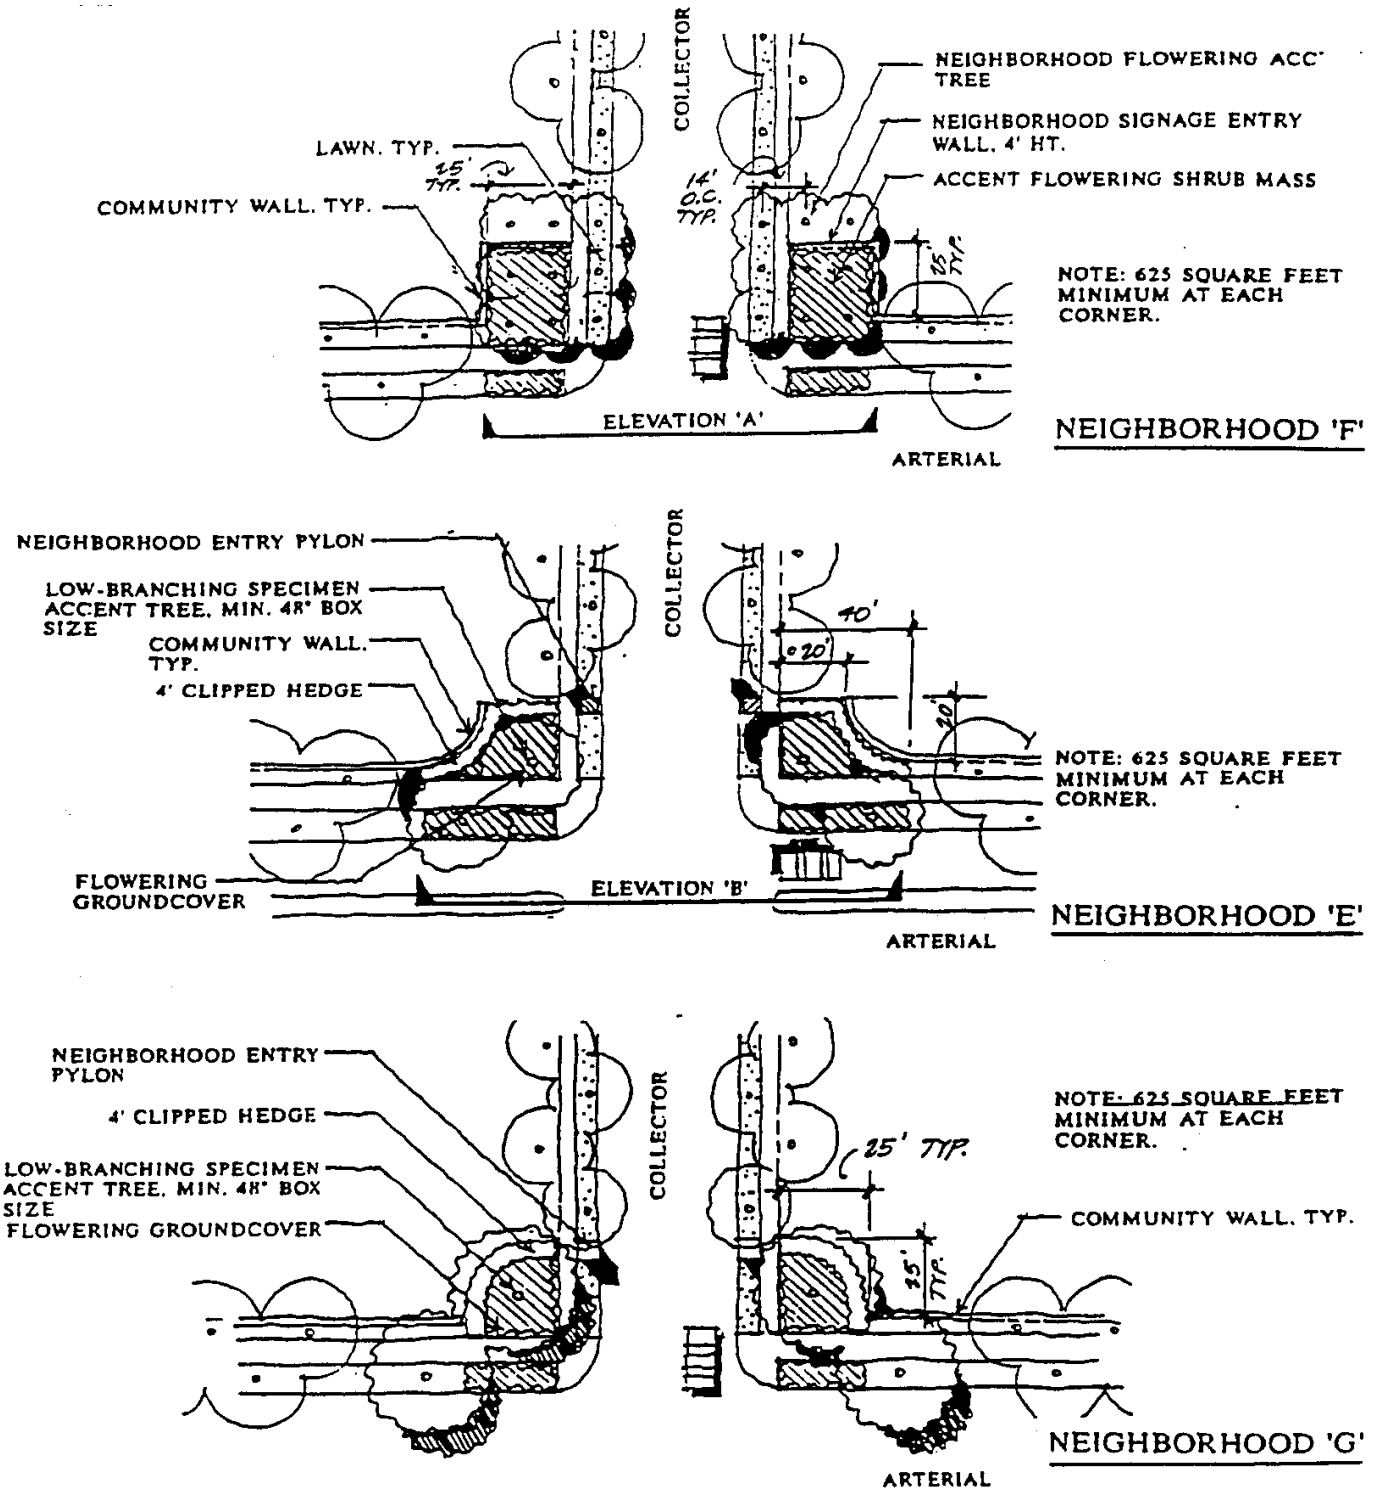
TYPICAL NEIGHBORHOOD E, F, AND G ENTRY PLAN VIEW
